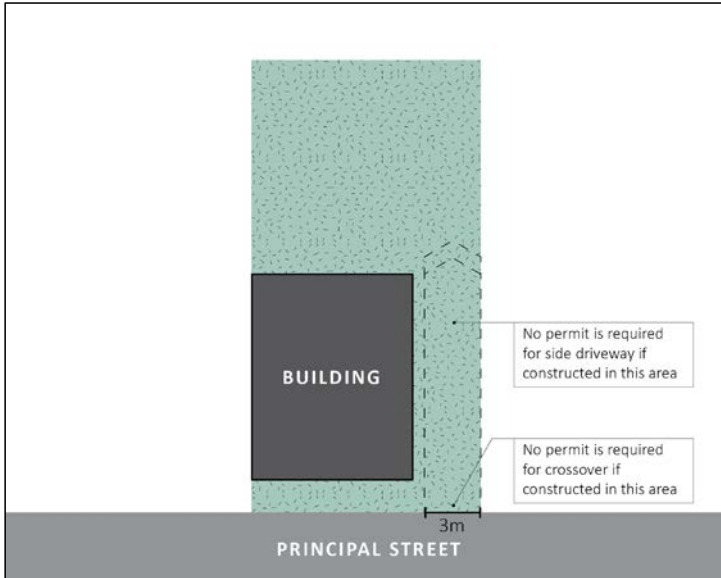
Construction of a new crossover and driveway is permit exempt if constructed in this location.
